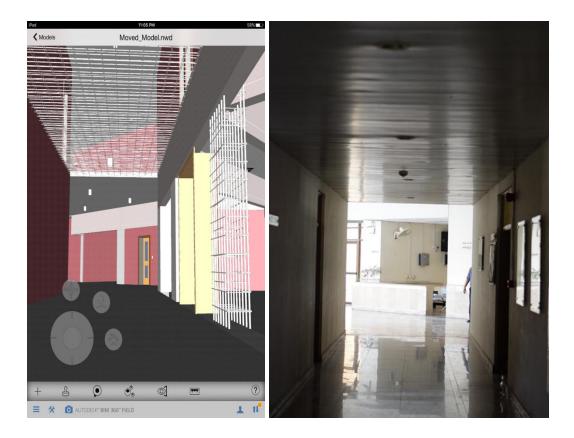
Virtual view with structural detailsFigure 4-6 Real time view (structural)
